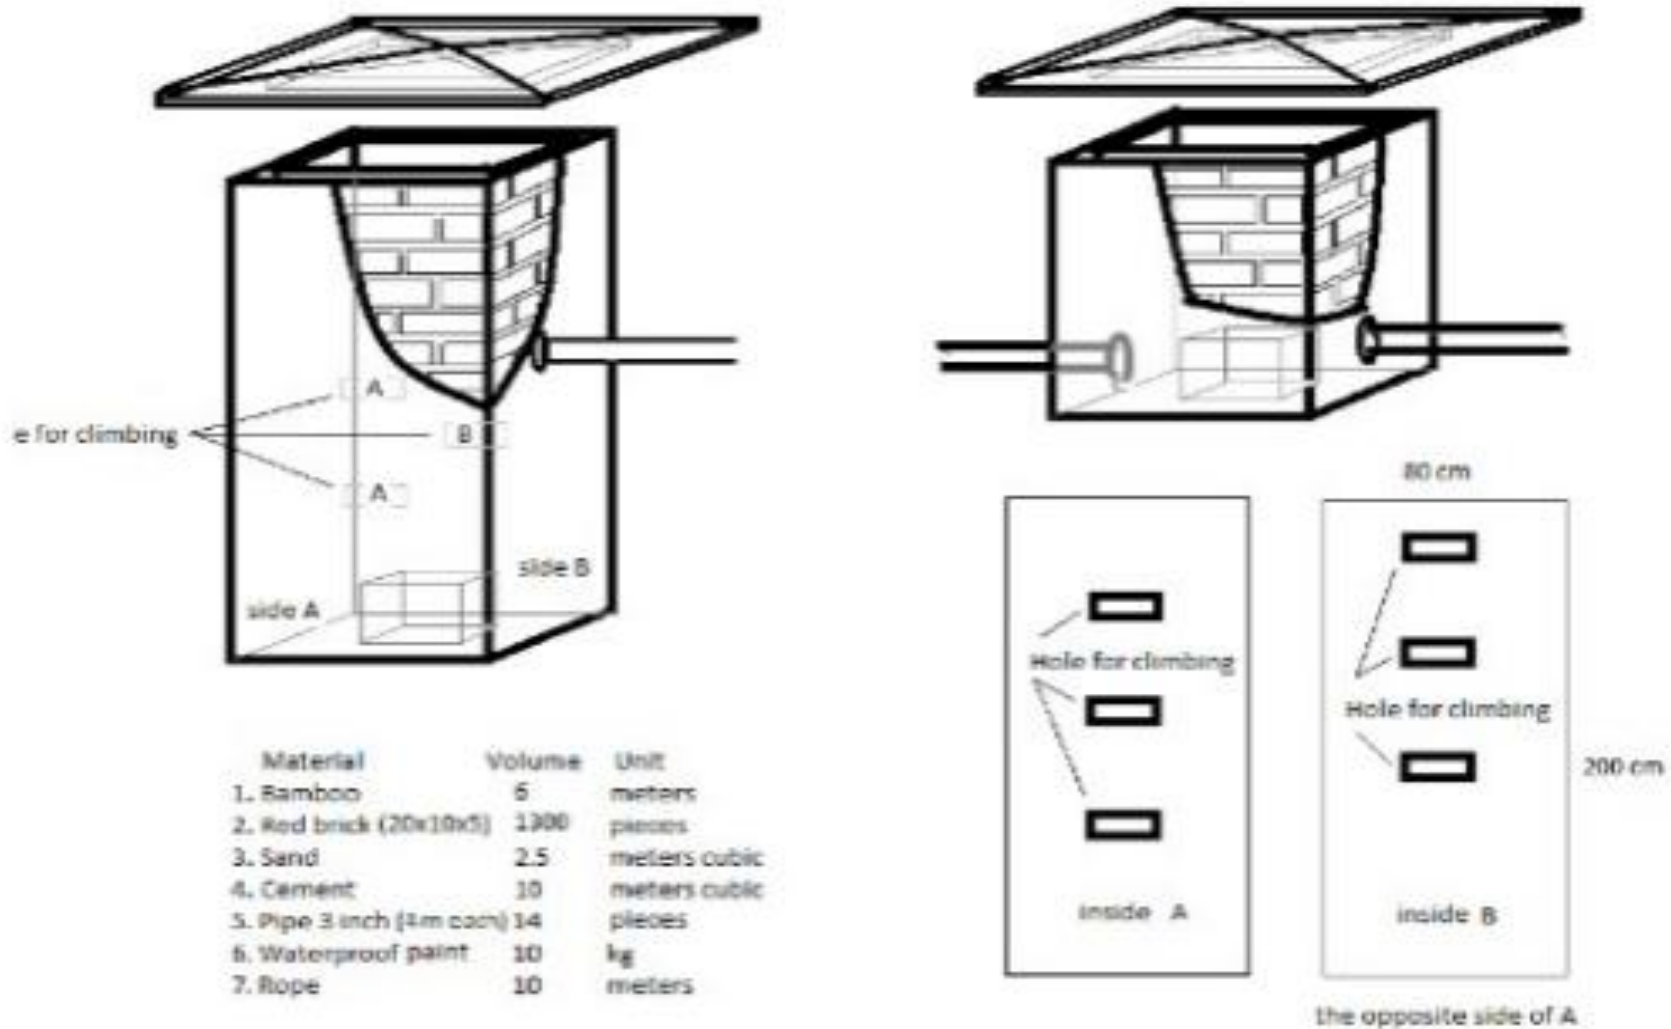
b : Design plan of construction of Sensor hut and Pre-amp hut
